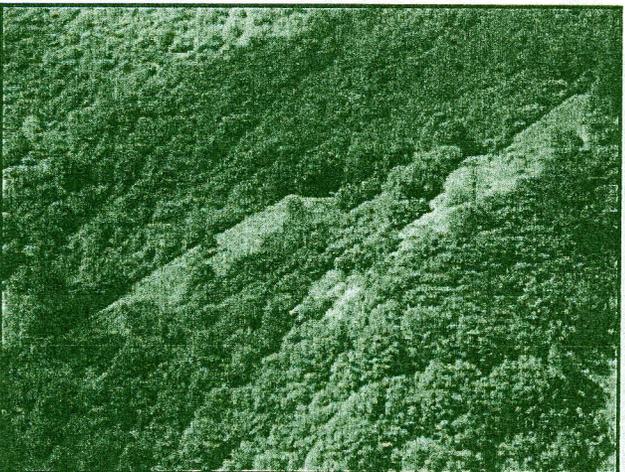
Photo taken from Mosquito Ridge Road overlook 1 mile east of mine site. Photo shows slope failures at the toes of waste dump #2 and #4.
